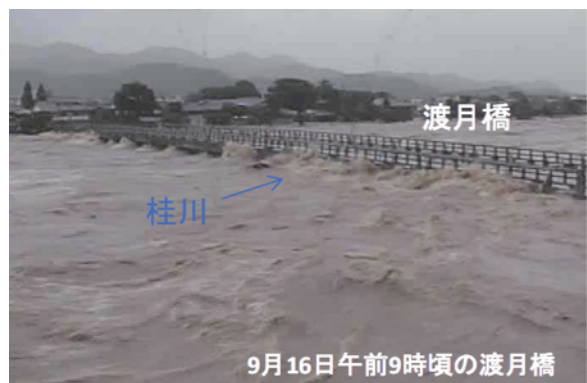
Flood water hitting Togetsukyo bridge around 9:00 on Sep.16
